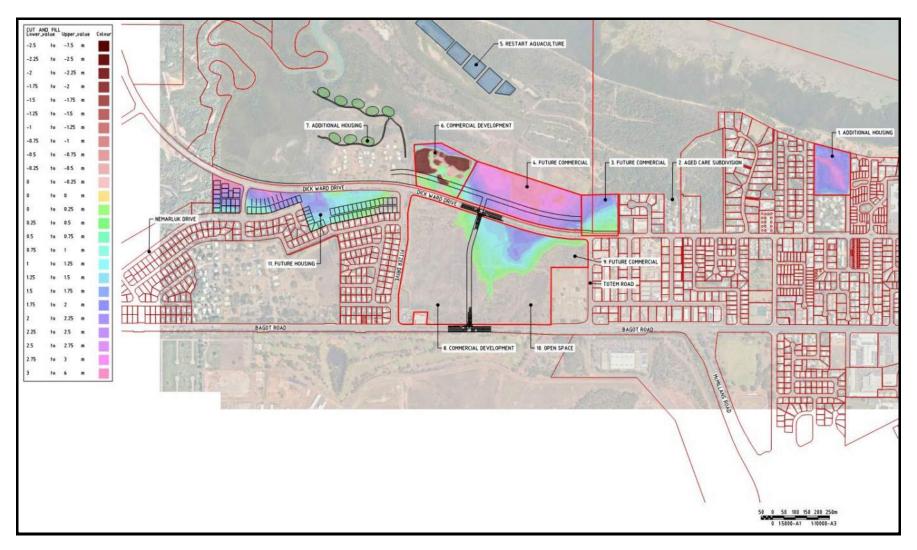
Cut / Fill Earthworks Plan AHD 6.2m
